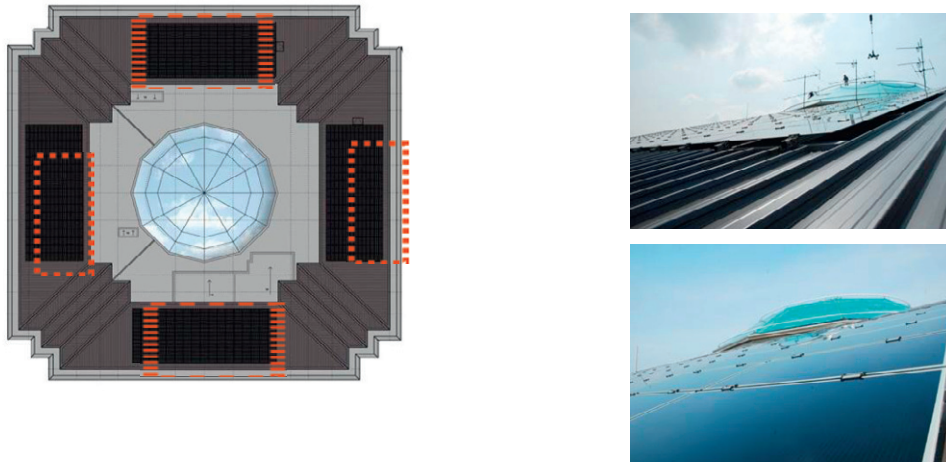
Roof plan (left) showing locations of the BIPV panels; photos (right) showing the BIPV panels on the roof.
